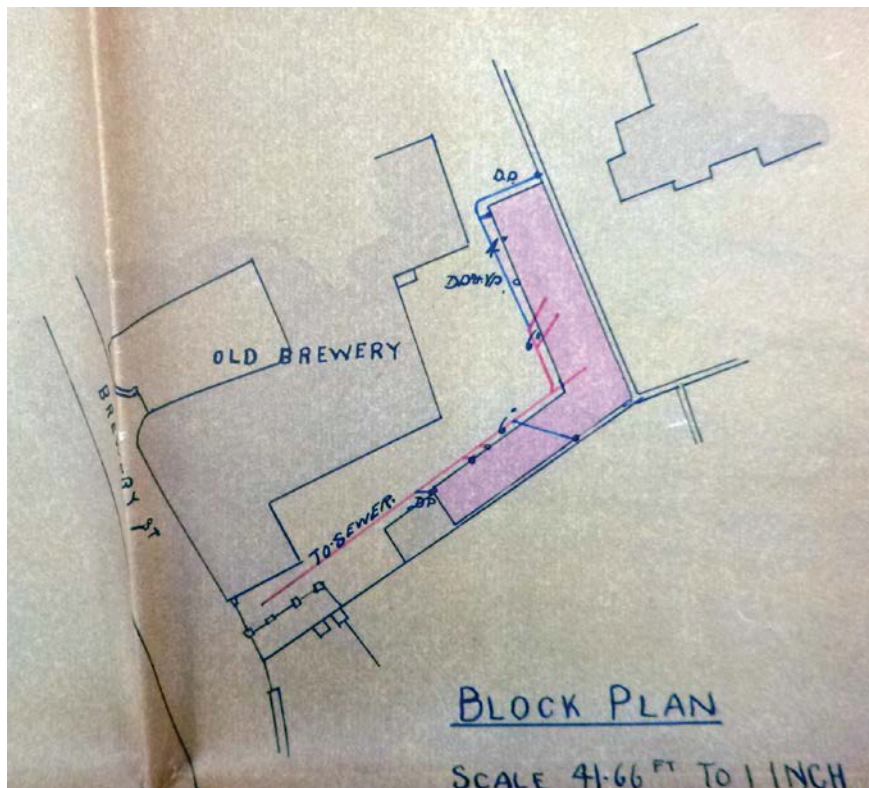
Block plan for proposed stables to the Old Brewery, 1898
